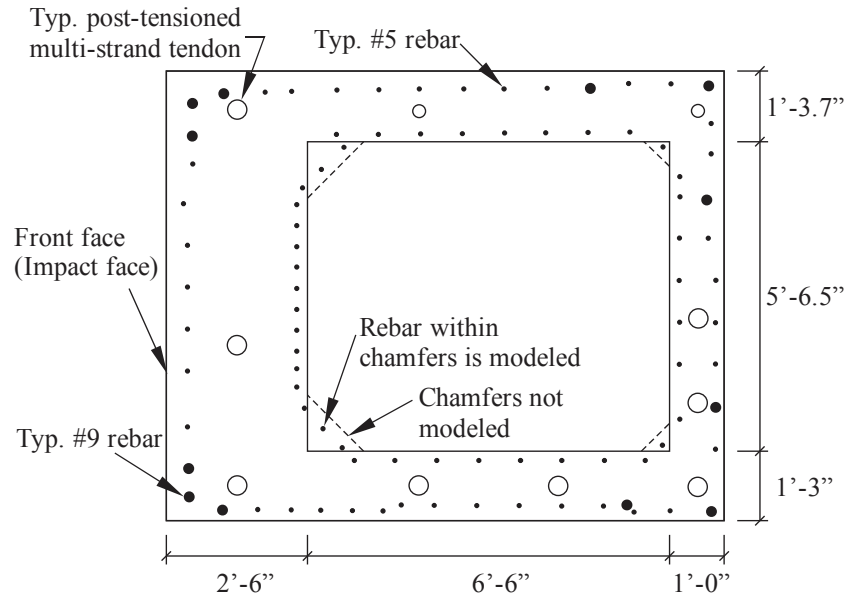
Pattern of steel reinforcement within concrete cross-section
